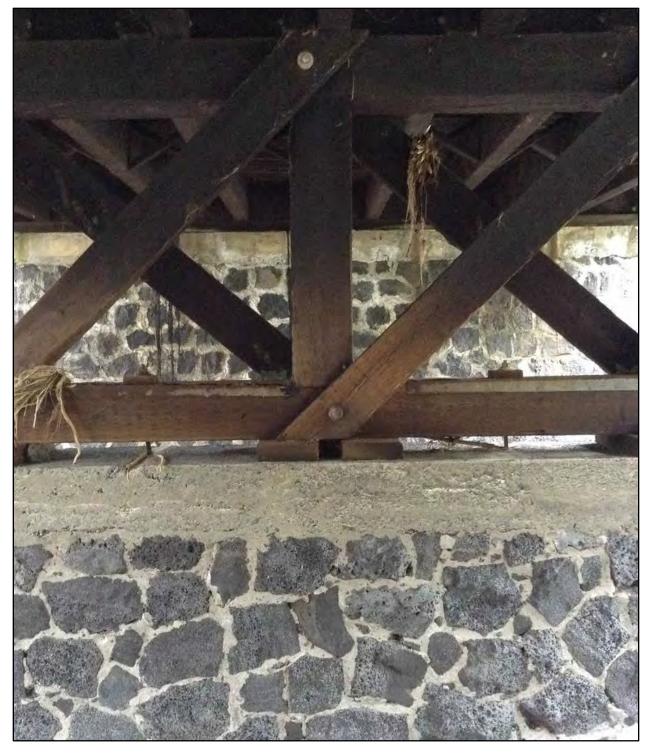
Hilea Bridge (SIHP # 50-10-74-30298) structural support beams and foundation, view to north
